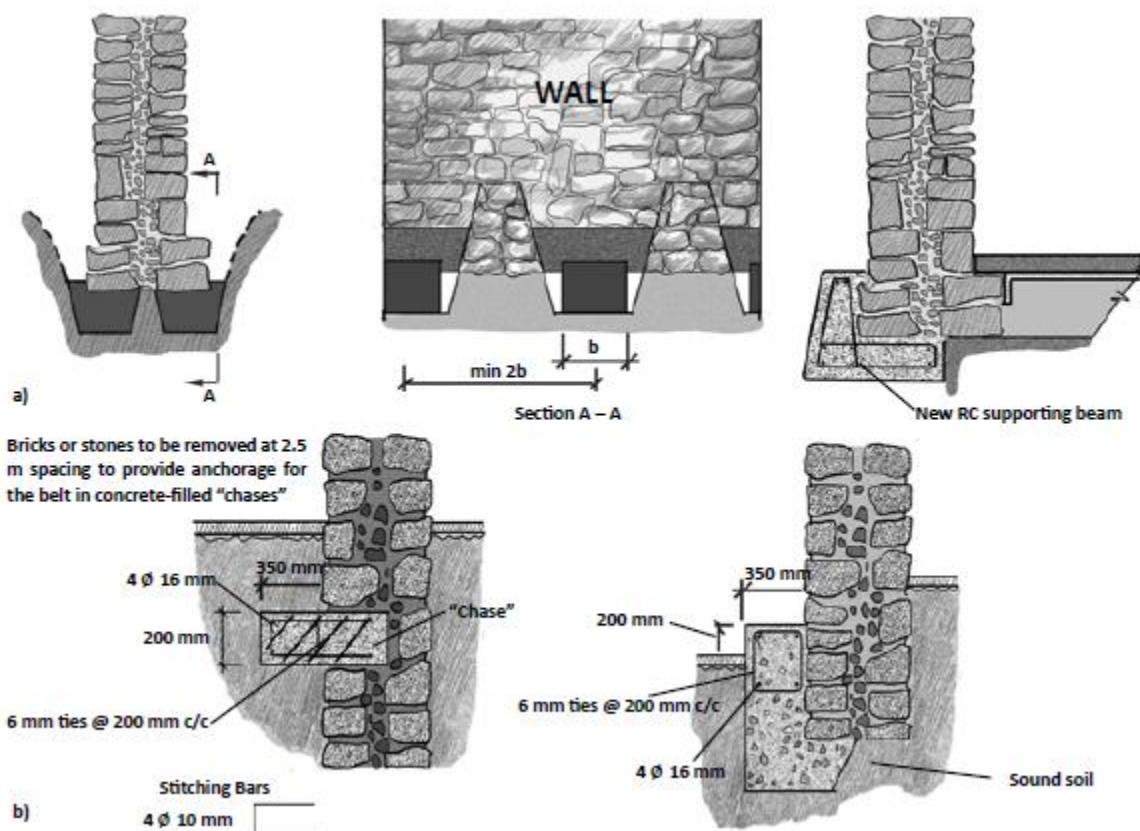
Strengthening existing foundations: a) underpinning the foundation, and b) external RC belt (adapted from: GOM 1998 and UNIDO 1983)
